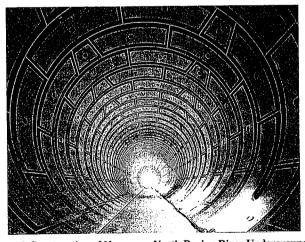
Construction of Neyagawa North Region River Underground Diversion Furukawa Control Pond
